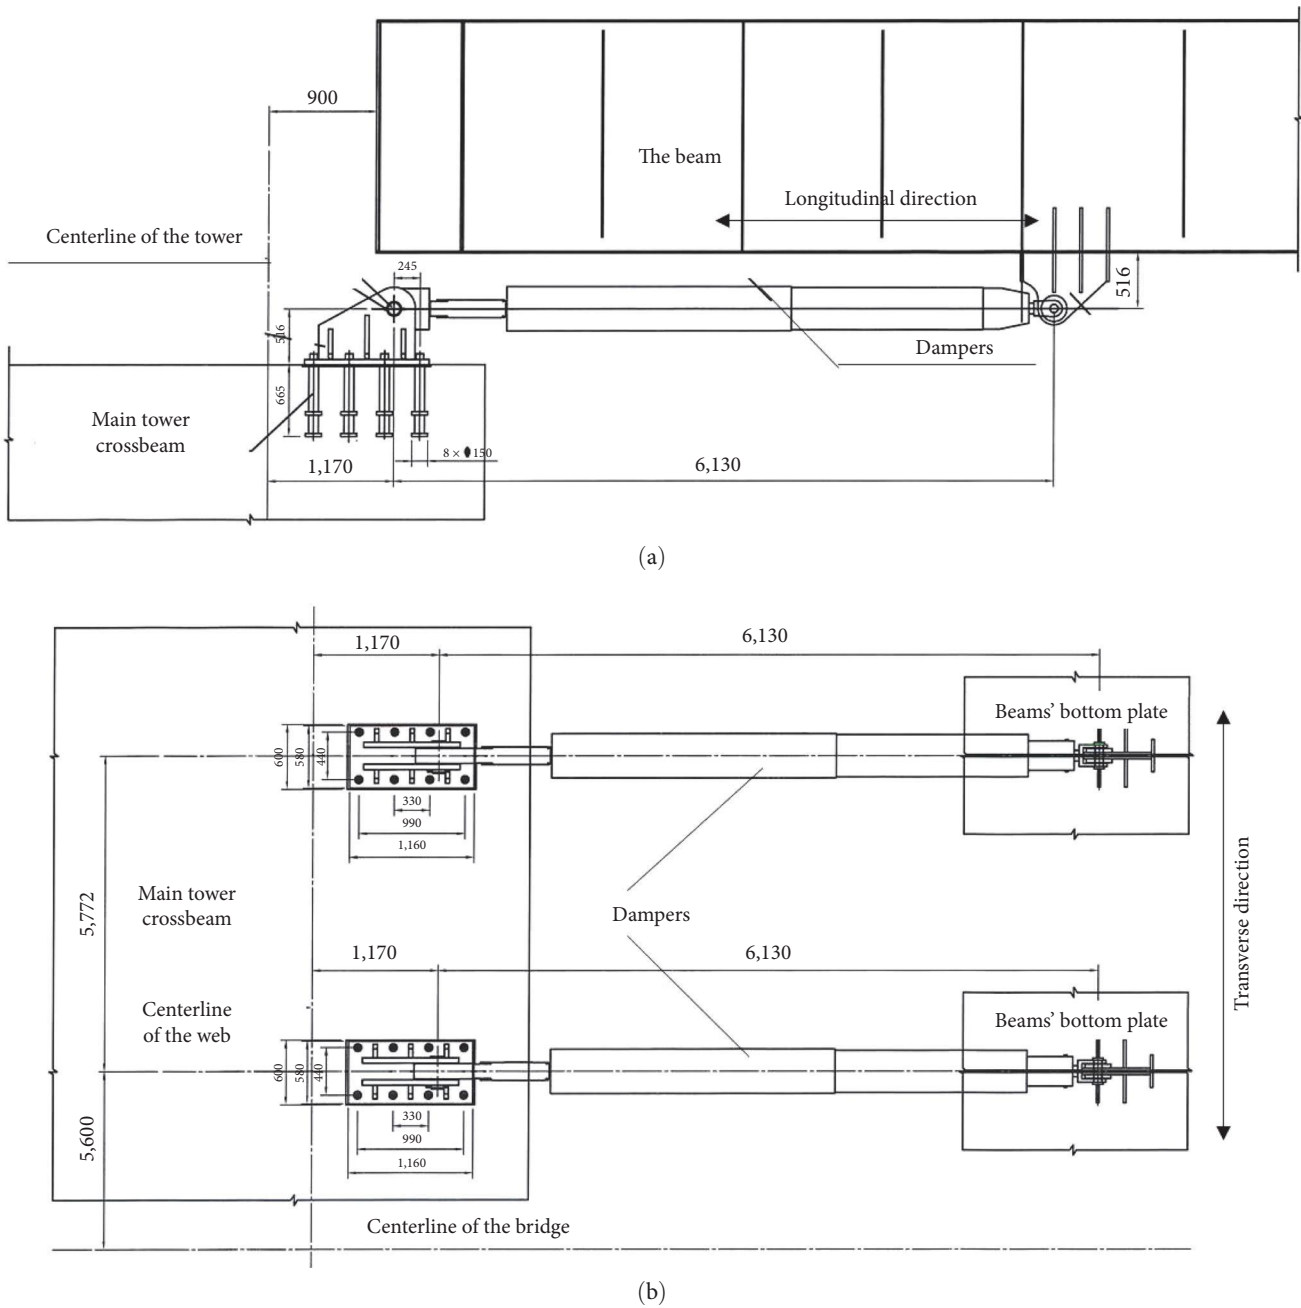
The arrangement of multiple groups of dampers: (a) elevation view and (b) plan layout.
